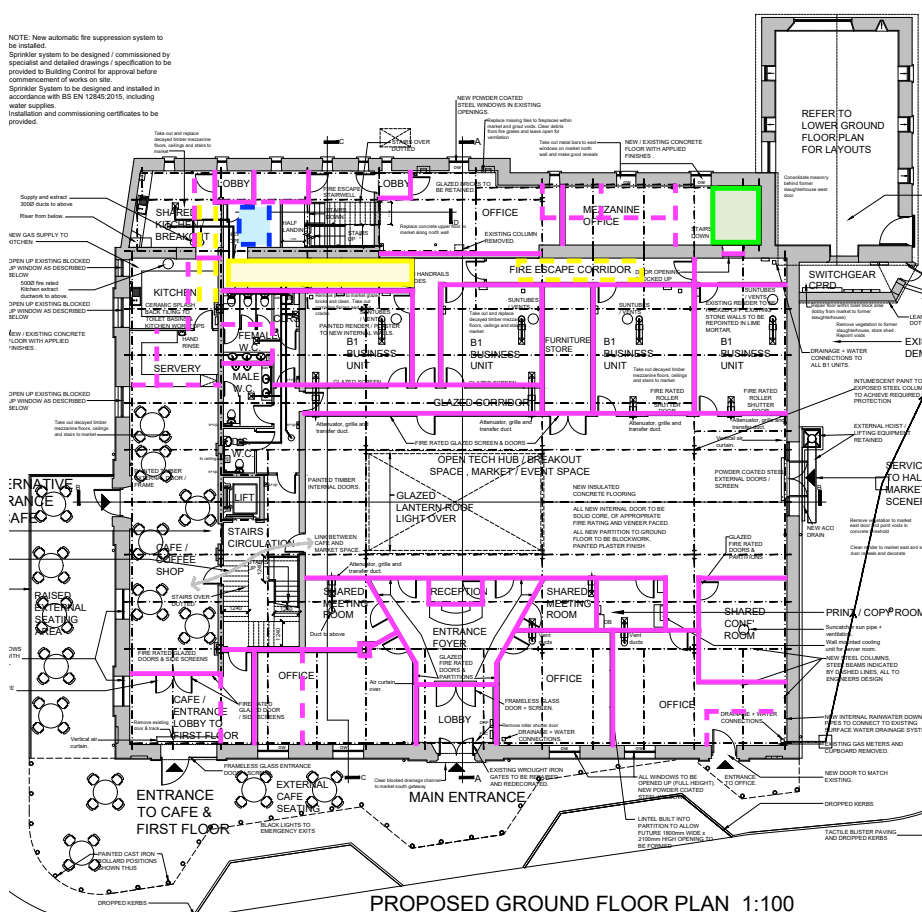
opposite: Proposed upper ground floor plan – Source Pembroke Design Ltd
